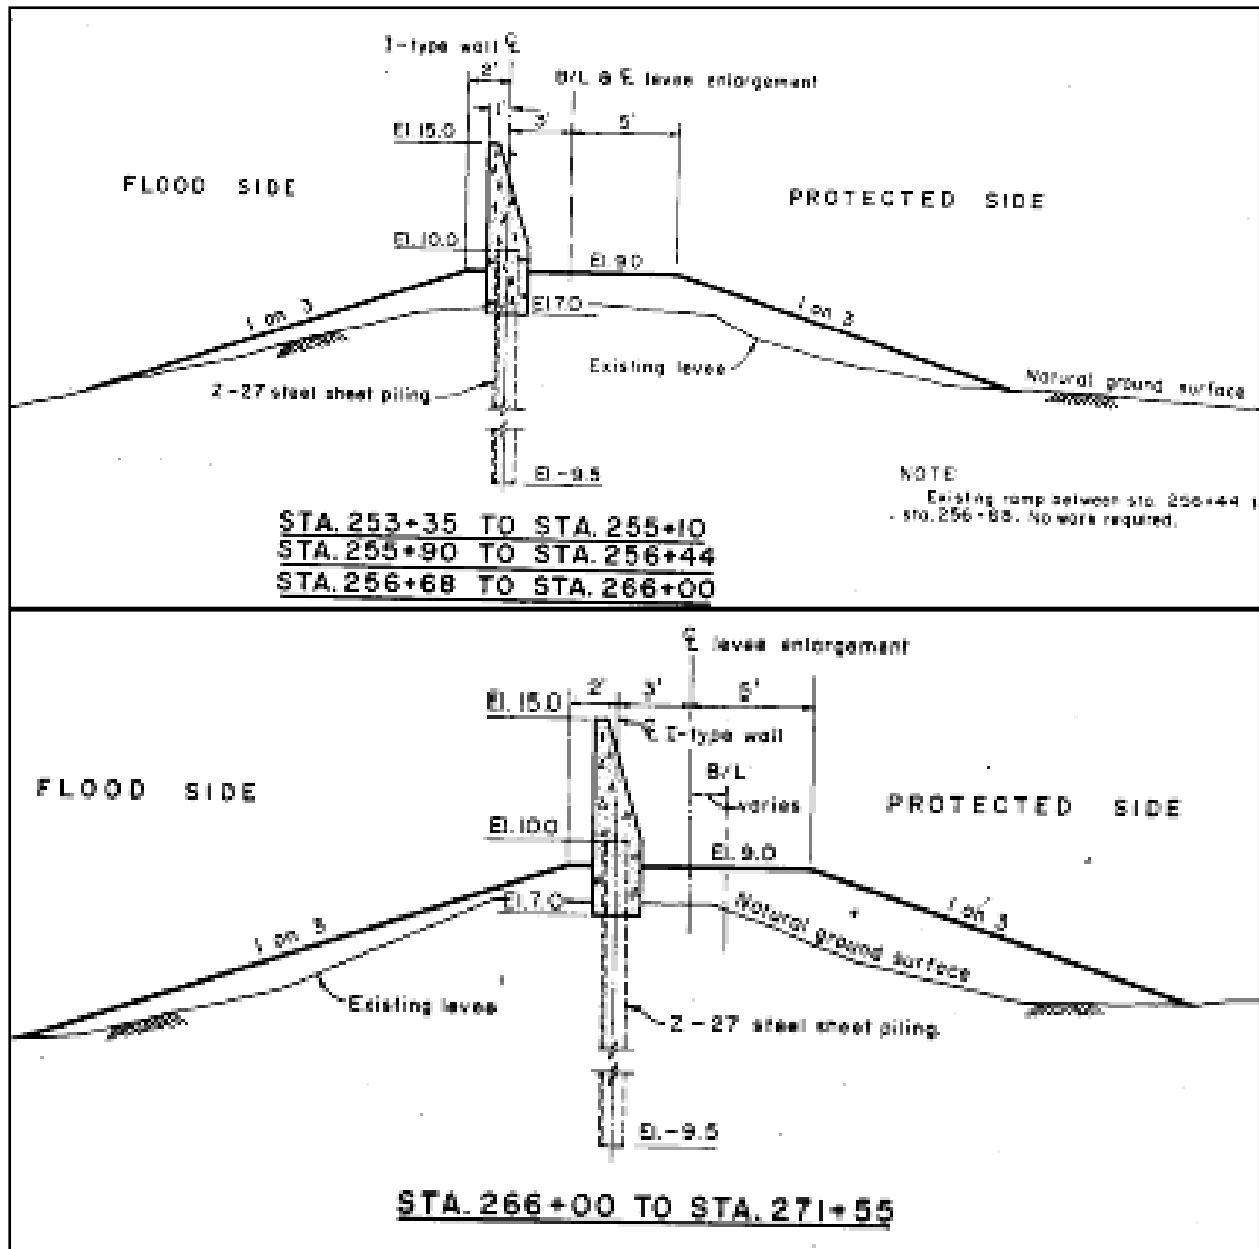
NOE4_O. Plate 28 Shows Elevations
